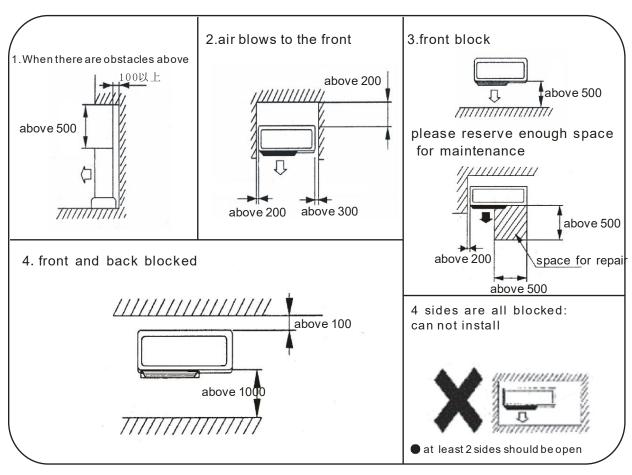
Horizontal type installation space, side air outlet (units: mm)
